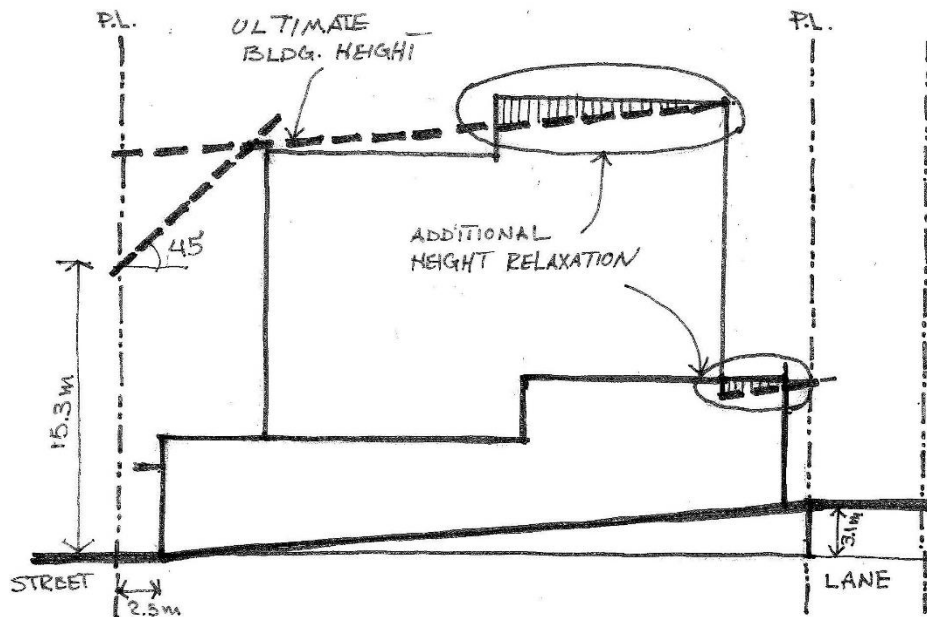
Building hHeight envelope relaxed for stepped building on sloping site
